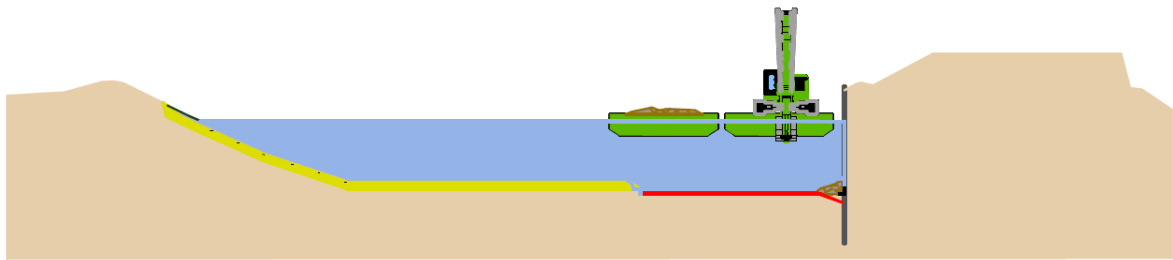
Cross section of the canal canal widened with a sheet pile construction (www.julianakanaal.nl)
